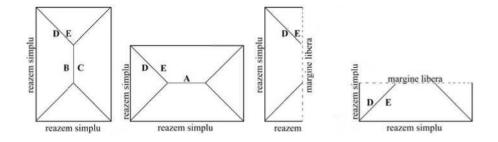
Route of failure lines for walls loaded perpendicular to the plane (examples)
